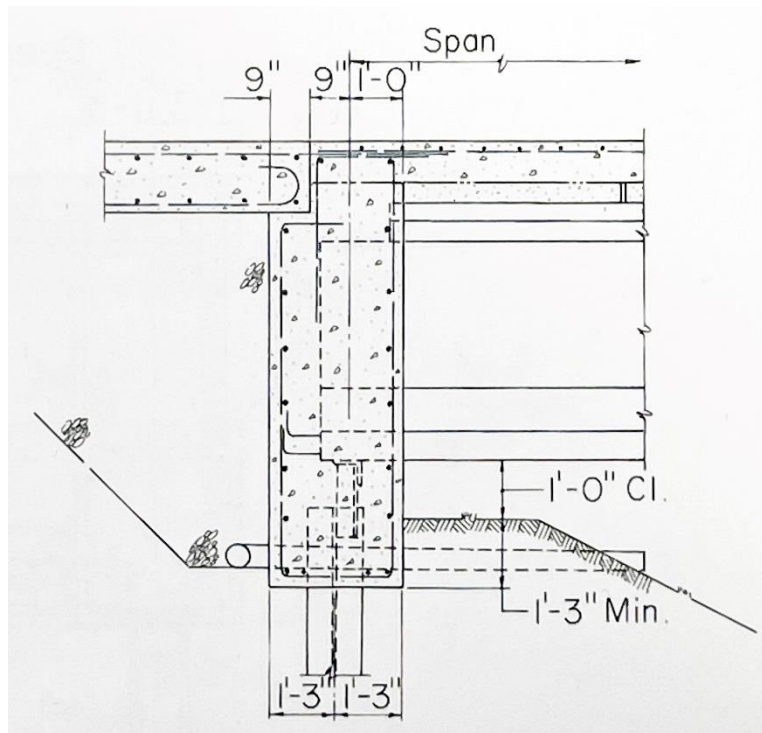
Integral Stub-Type Abutment Detail (Burke 2009)
